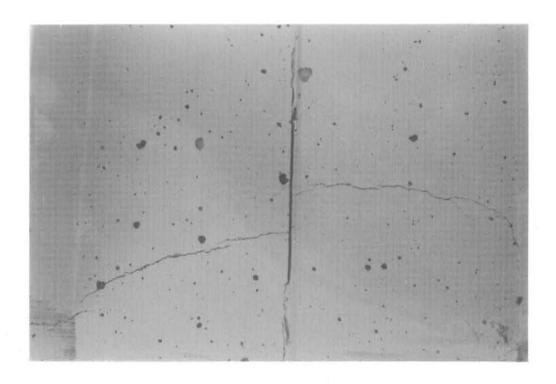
Hairline Shrinkage or Settlement Cracks and Air Voids.
